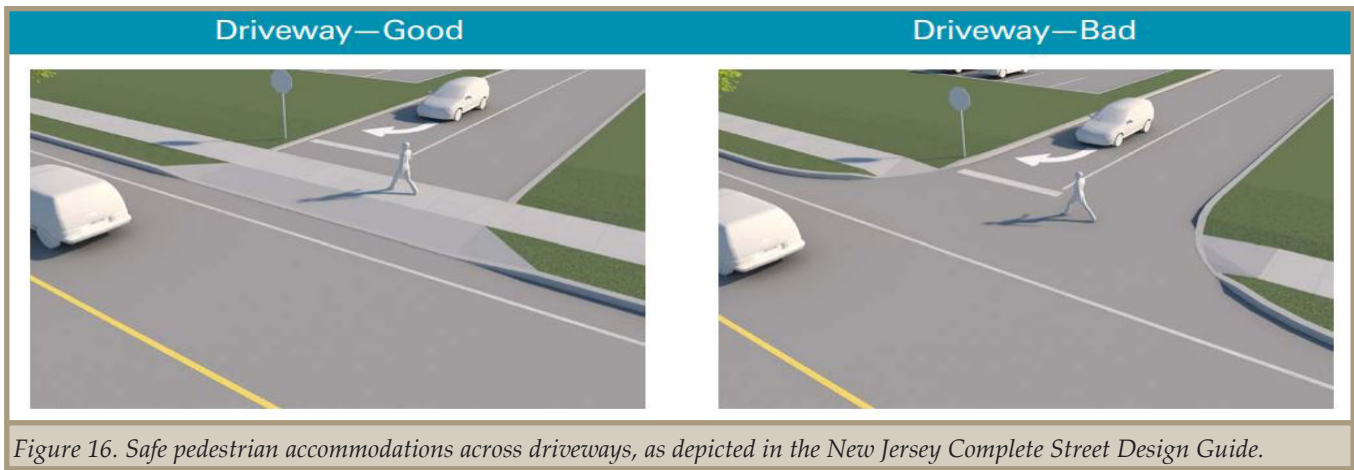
Safe pedestrian accommodations across driveways, as depicted in the New Jersey Complete Street Design Guide.
